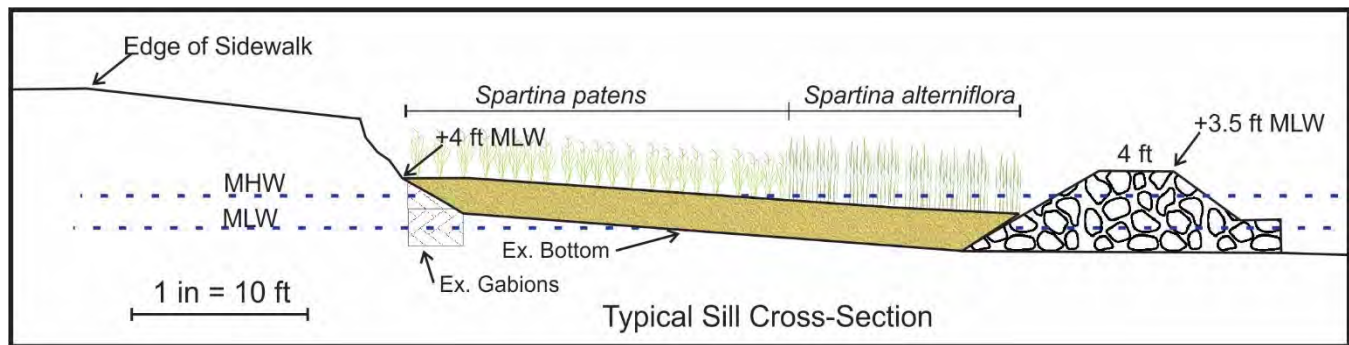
Typical sill cross-section for the Leesylvania conceptual plan.
